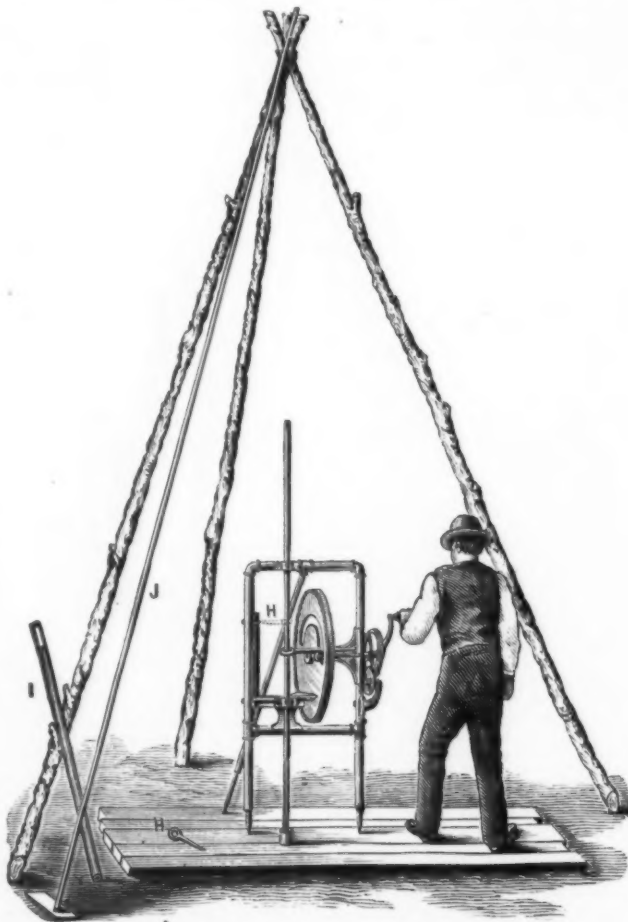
MACHINE FOR BORING TEST HOLES.
